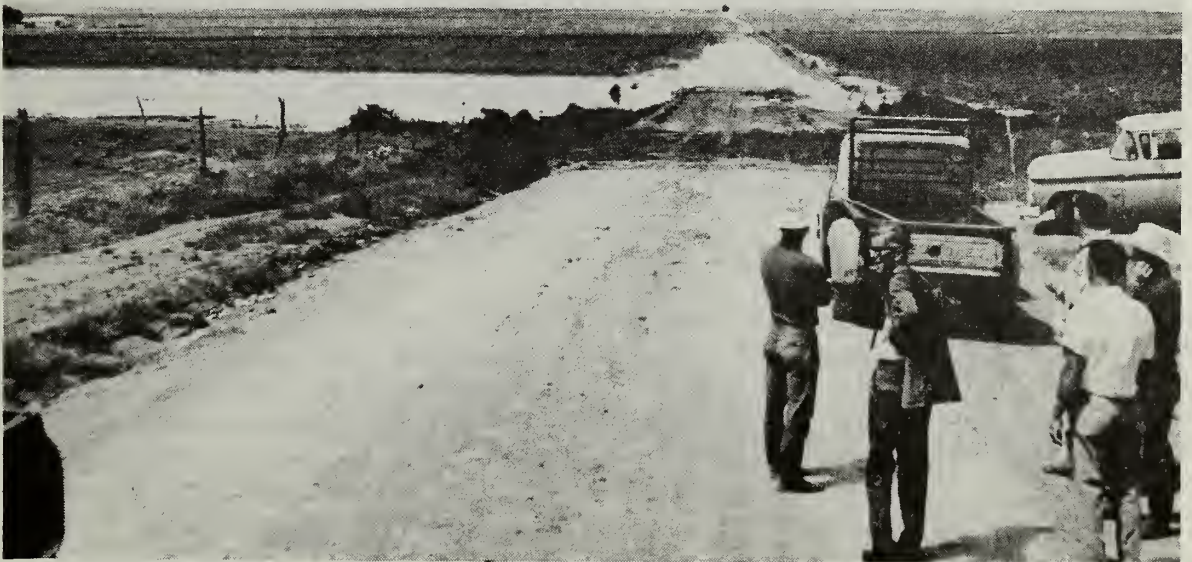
FLOOD DAMAGE TO ROADS AND CROPS
